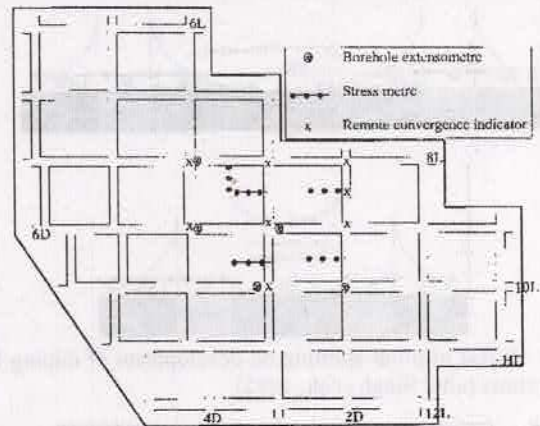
Plan view of the experimental panel with instruments for strata control observations.
